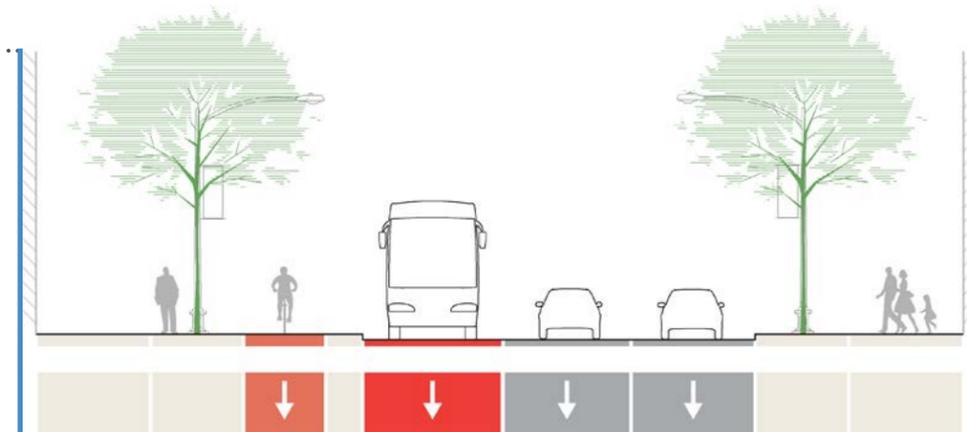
Eighth Street typical section Guadalupe Street to Trinity Street
